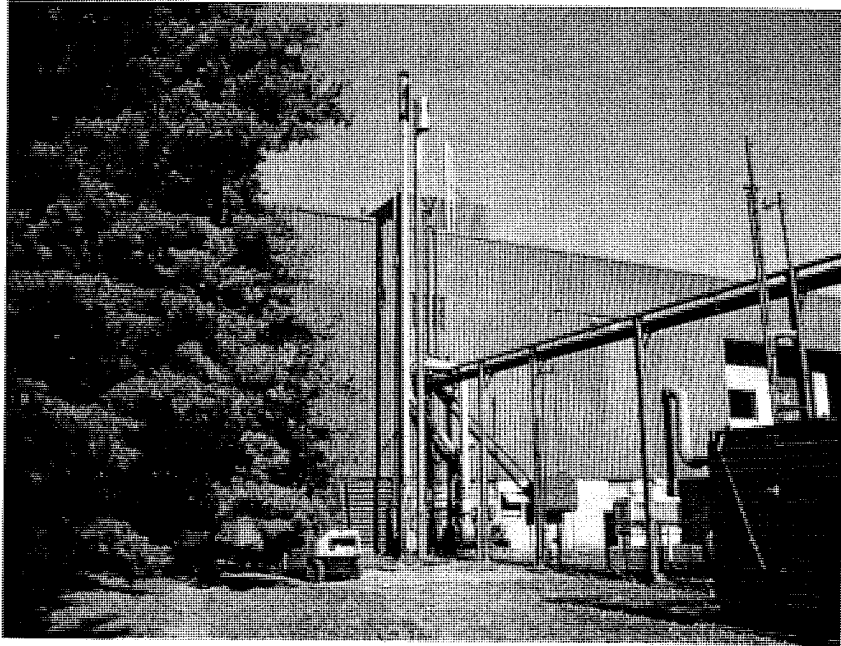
Photo showing the location of the proposed new facility on the southwest side of the existing CAER main lab building
